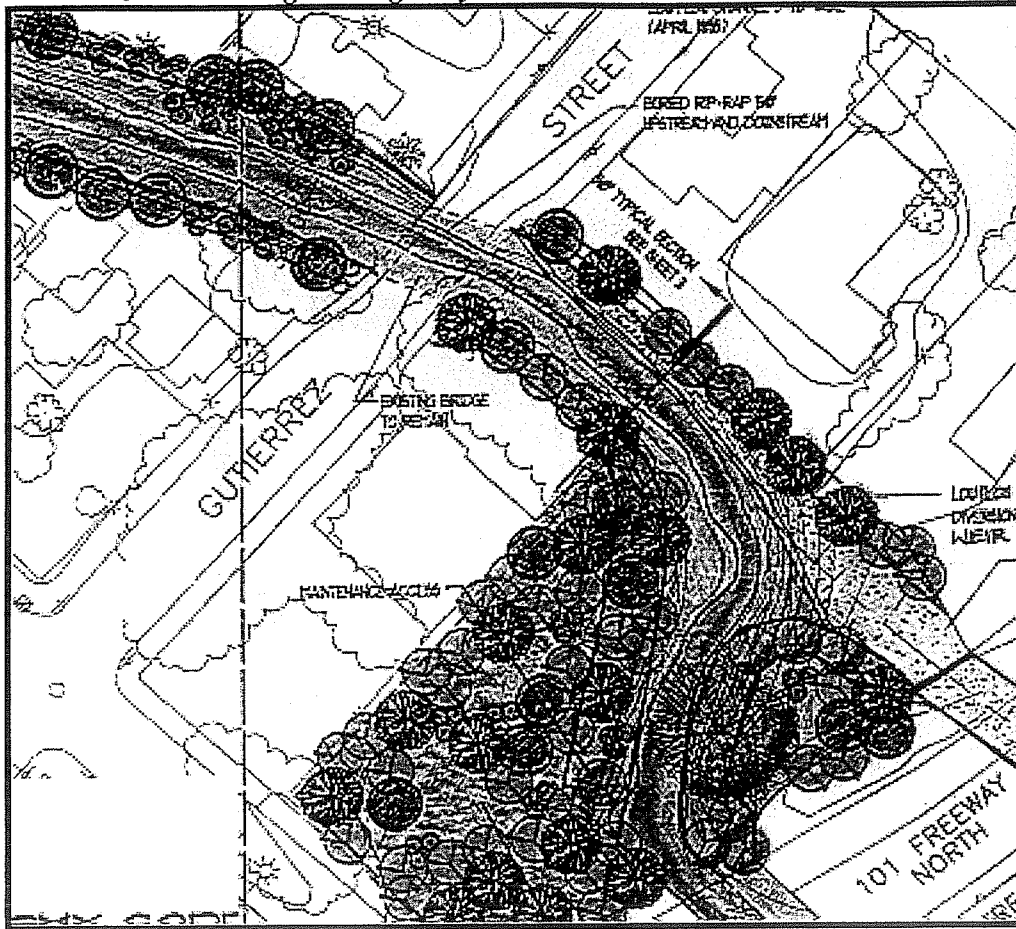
Gutierrez Street Bridge to Highway 101
